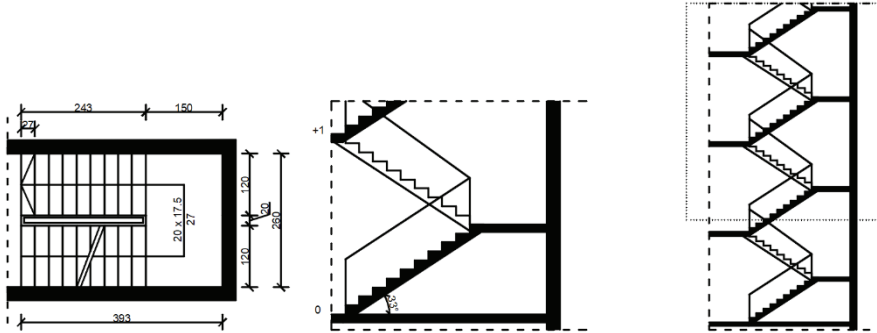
Technical drawing of the staircase. From left: plan at level +1, cross-section through the flight between floors 0 and +1, cross-section through the staircase showing the floors above, which are omitted in the simulation. Dimensions given in cm.
